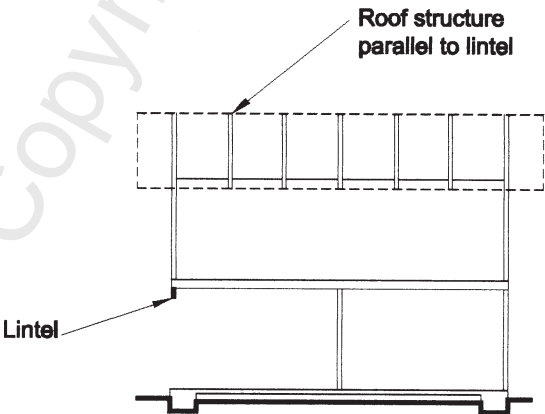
Lintel supporting wall and floor (truss parallel to lintel) (see 8.6.1.1 and table 8.12)
